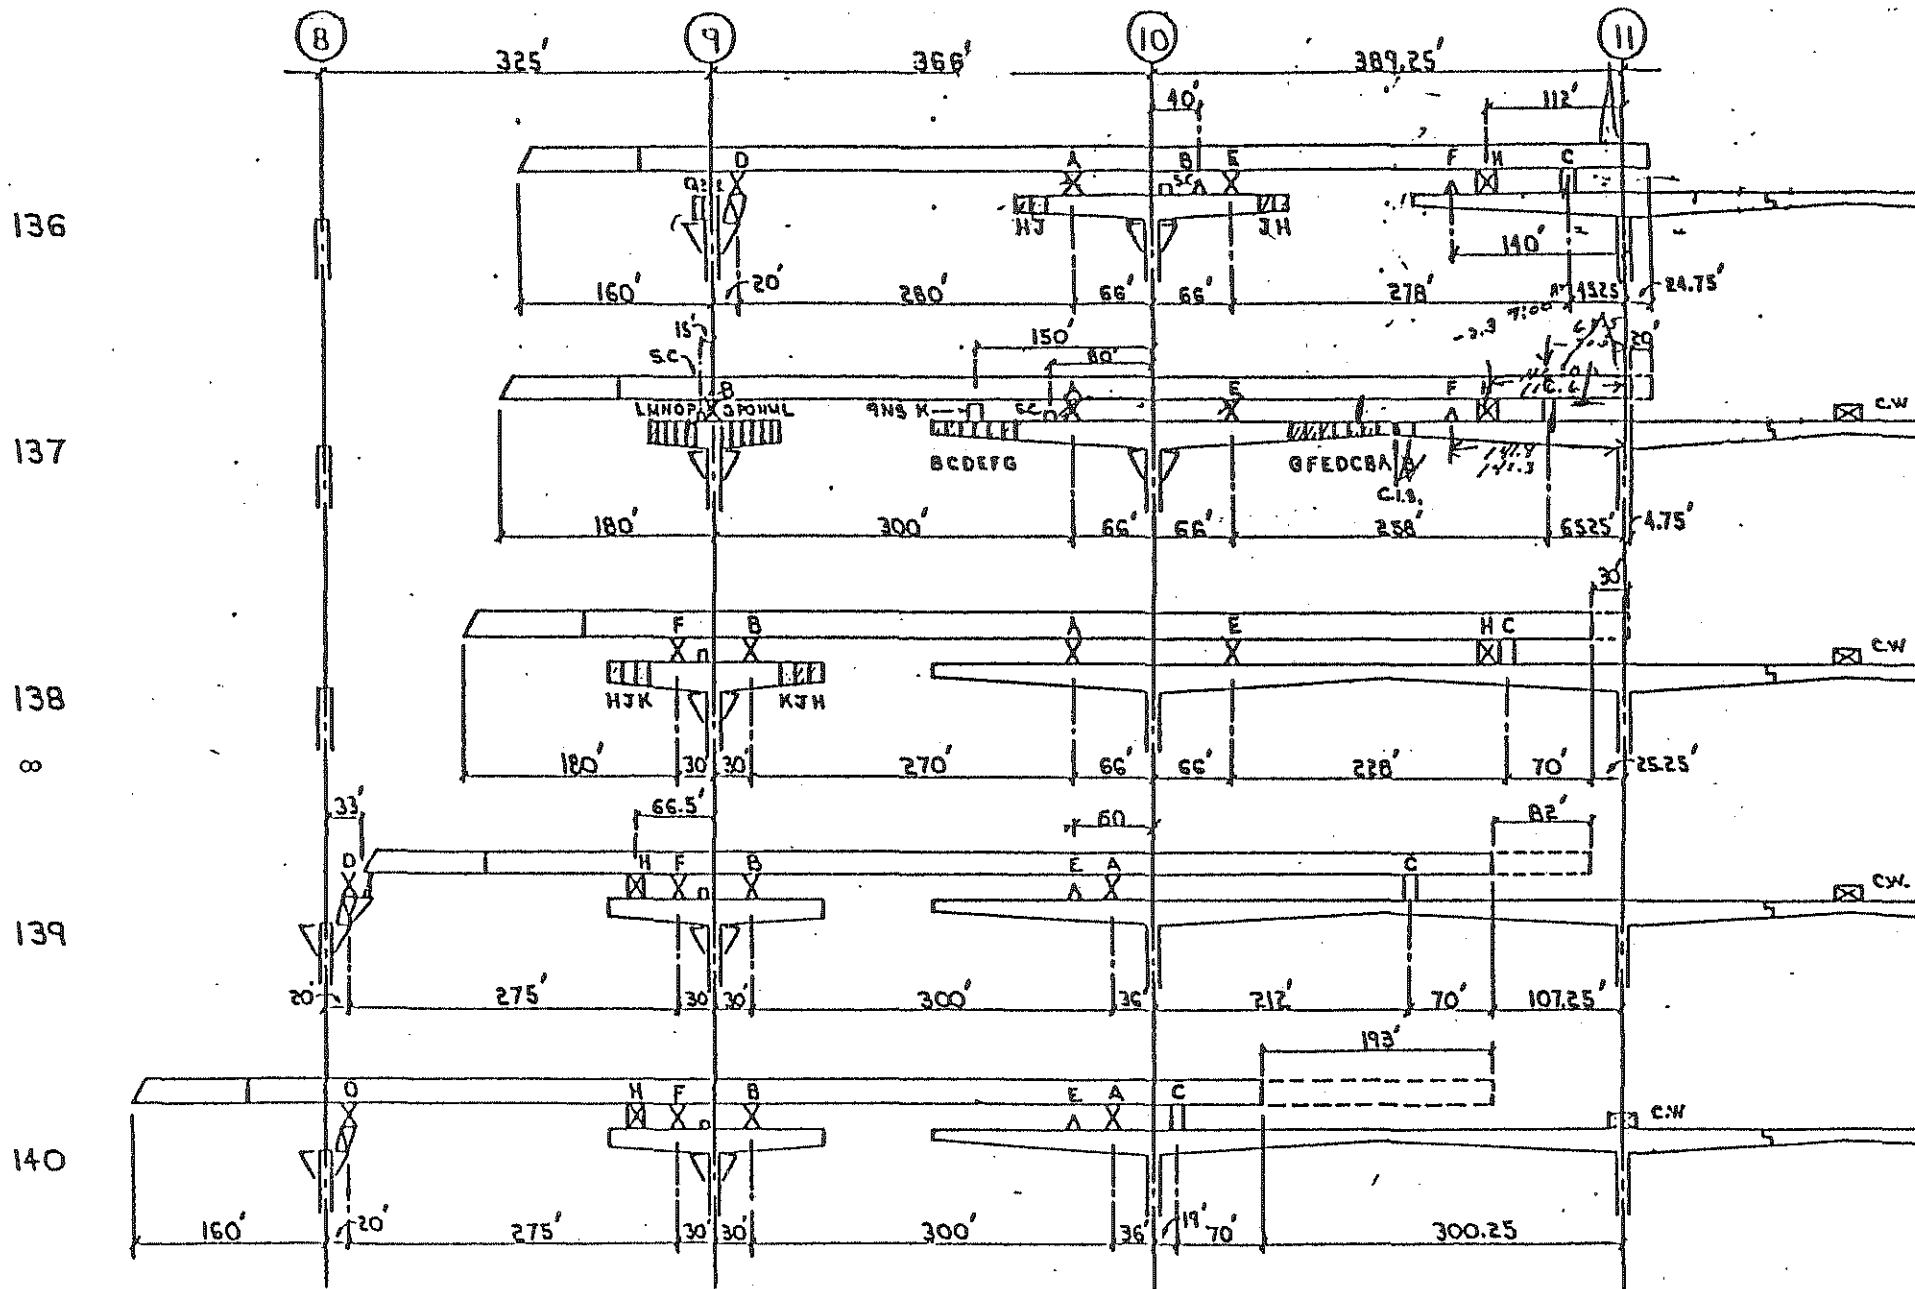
Schematic of construction at Piers 8, 9, 10 and 11. Copied from Launching Girder Handling Manual
